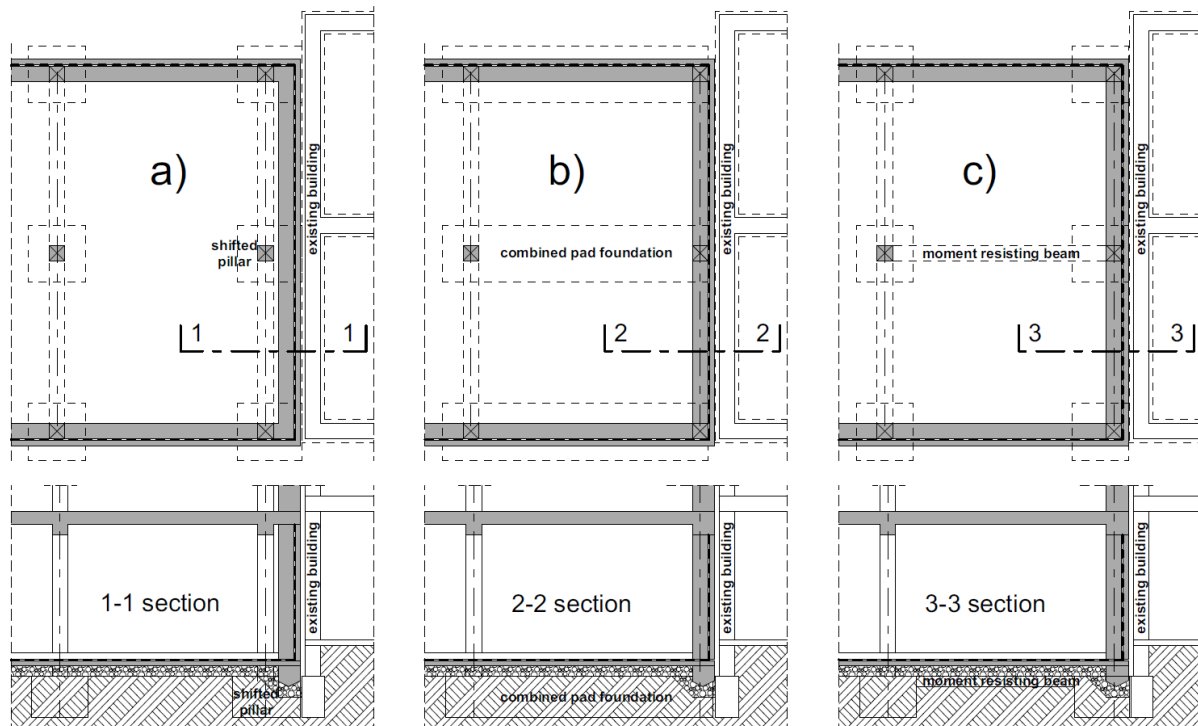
Construction of the pad foundation next to an existing building. a) shifted pillar, b) combined pad foundation, c) pad foundations connected by a moment resisting beam
